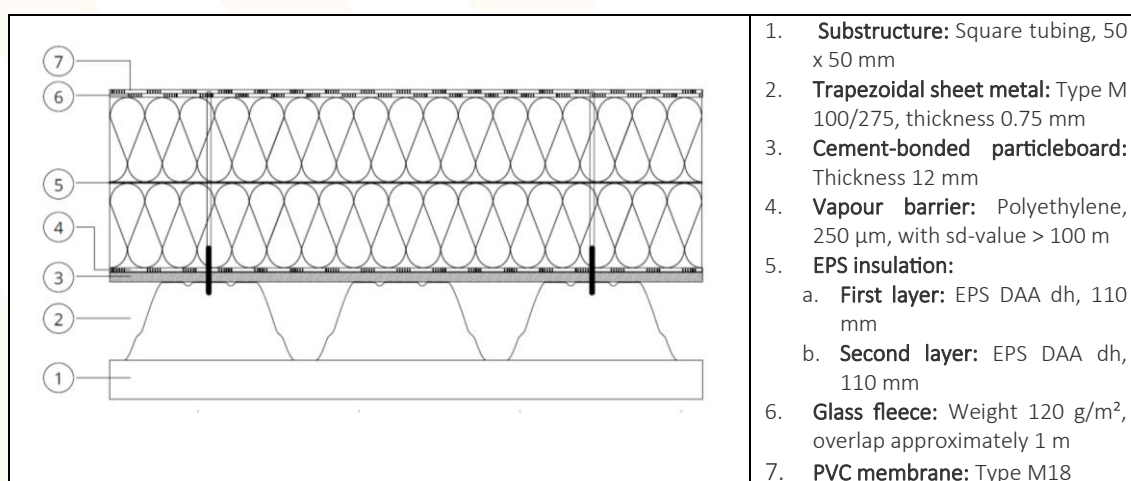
Cross-section of the roof structure: Tested industrial lightweight roof construction with EPS foam and a maximum overlap of glass fleece installation (Layer 6) beneath the PVC roof membrane.
